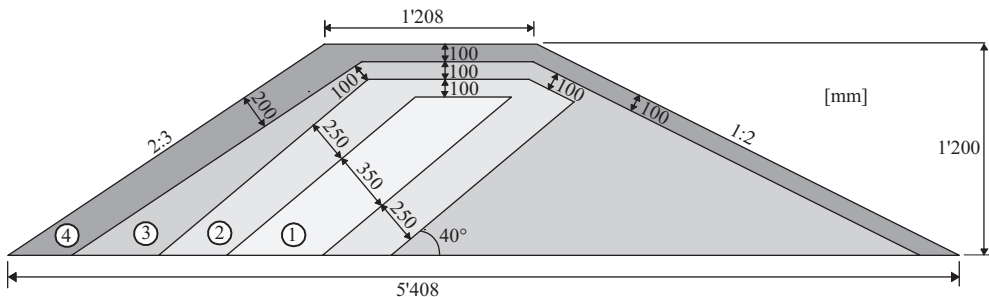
Fuse plug design and dimensions with (1) impermeable core, (2) filter, (3) embankment body, (4) slope protection.
